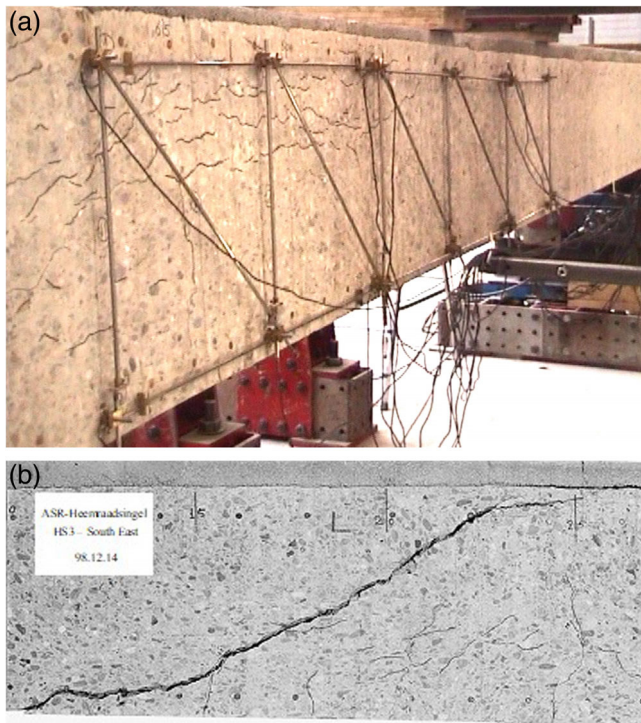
(a) Horizontal cracking in a beam sawn-out from a solid slab viaduct.⁸ (b) Shear tension failure as observed in laboratory shear test.⁸
